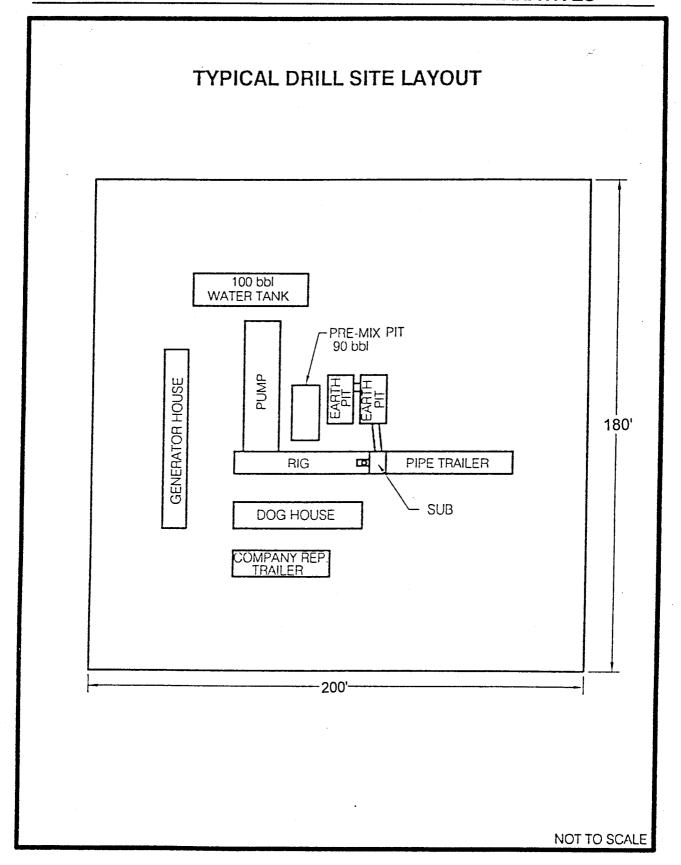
Typical CBM Drill Site Layout - Cow Creek Pod.
